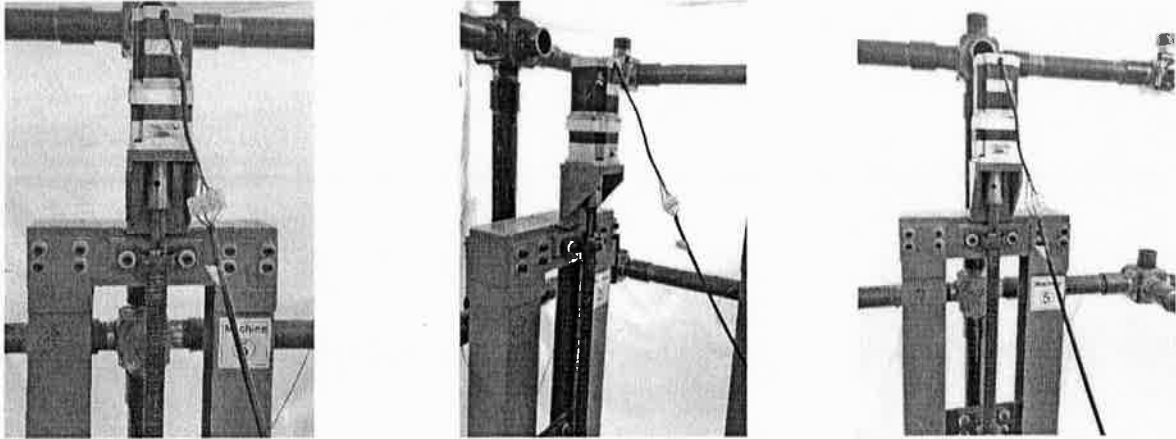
Structural frame assembly comprising of beams and columns made of steel pipe sections
